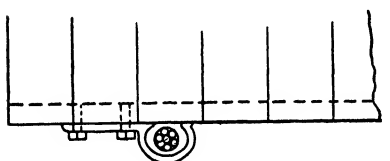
Method of Fastening Rope Guide to Hatch Trimmer
